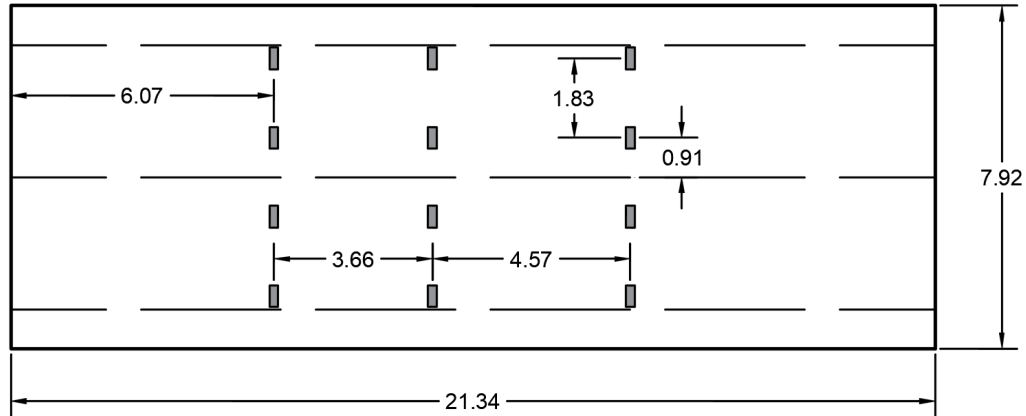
Kathol et al. (1995) test bridge system off loads.
